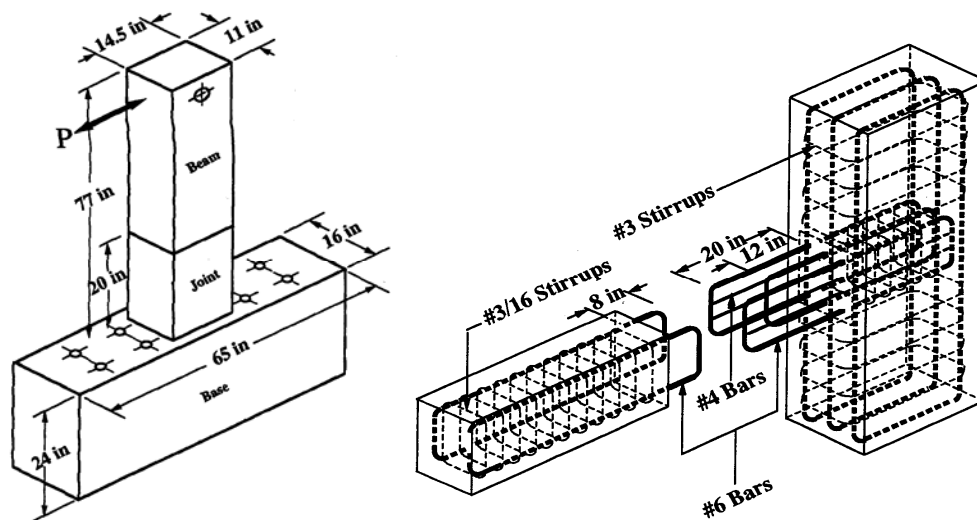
34: Typical beam-column specimen and reinforcing arrangement from [43]
